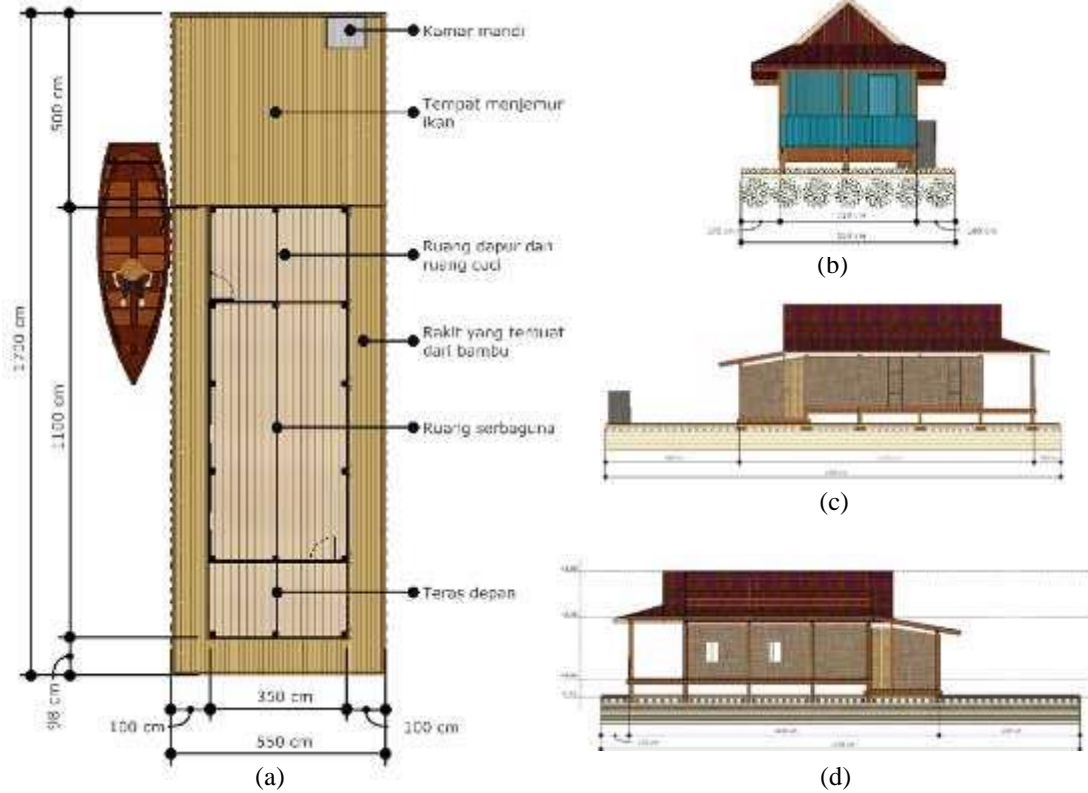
(a) Floating house plan, (b) Front view, (c) Side view, (d) Section
